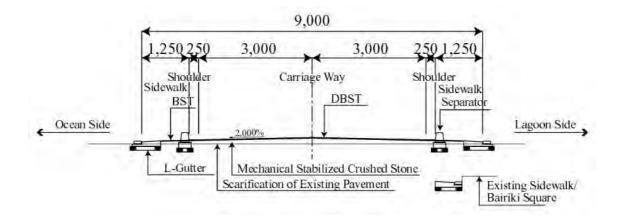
Standard Cross-Section: South Tarawa Road in Bairiki (2)
